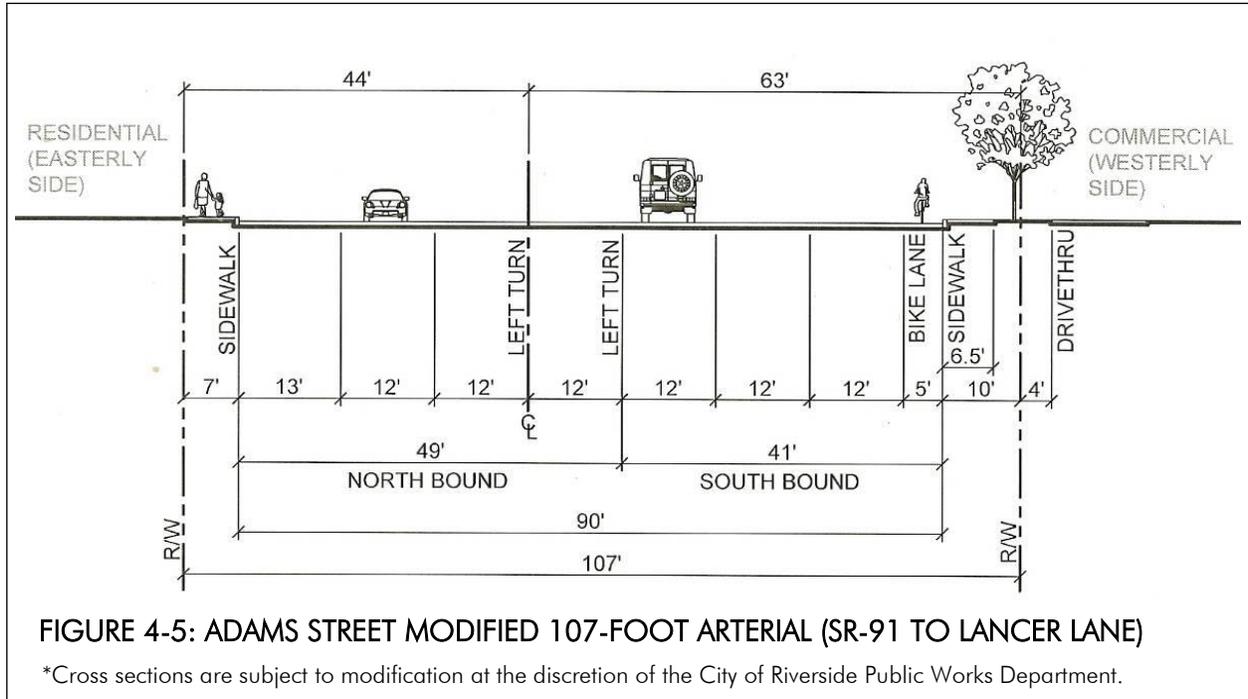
ADAMS STREET MODIFIED 107-FOOT ARTERIAL (SR-91 TO LANCER LANE)
